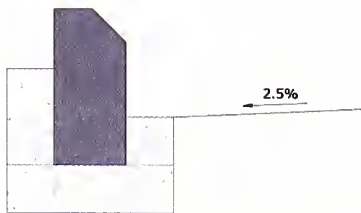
A Standard Design of Non-Mountable Concrete Kerb
